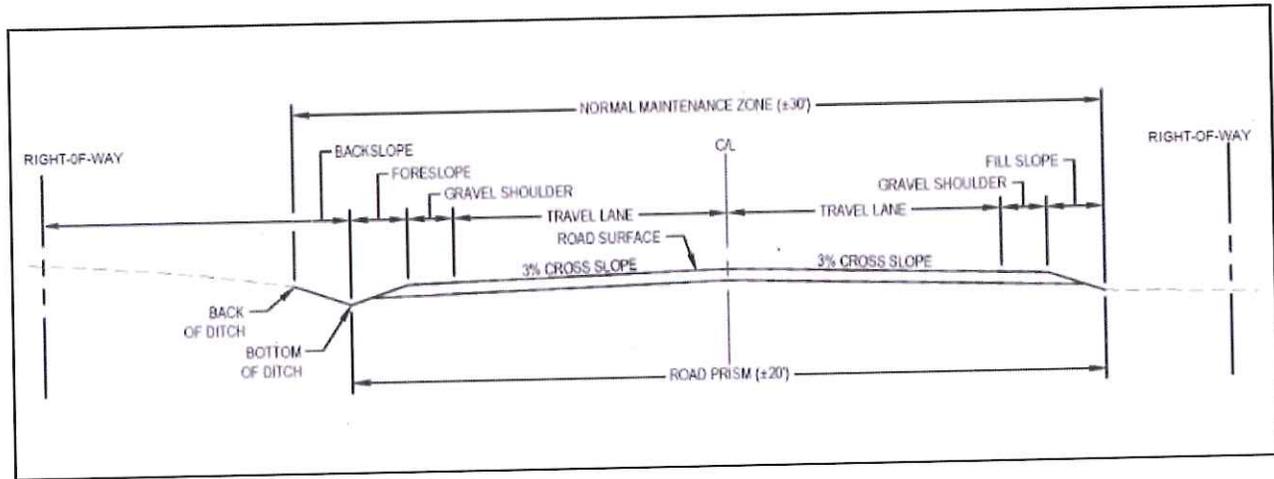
Typical Road Section for Gravel and Paved Surfaces
